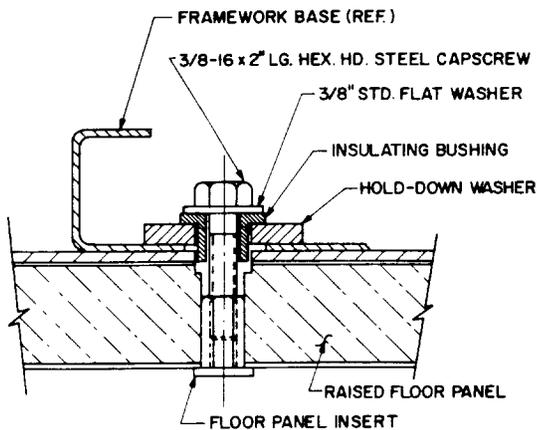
Typical Frame Hold-Down for Installation on Wood-Core Floor Panels
